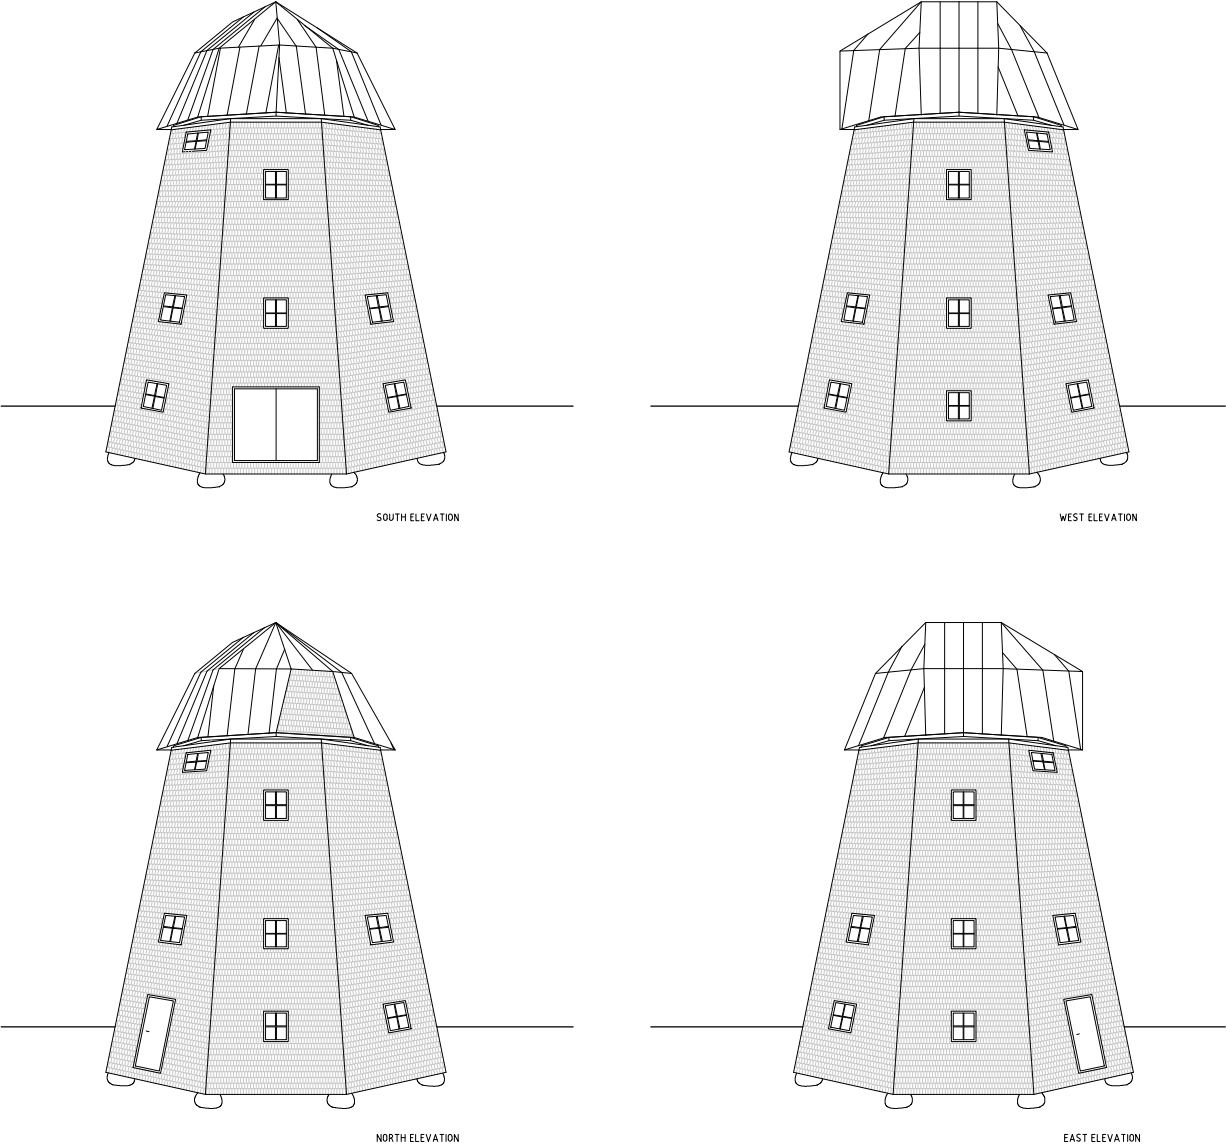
Existing elevations of the Pilebo windmill, scale 1:200.
